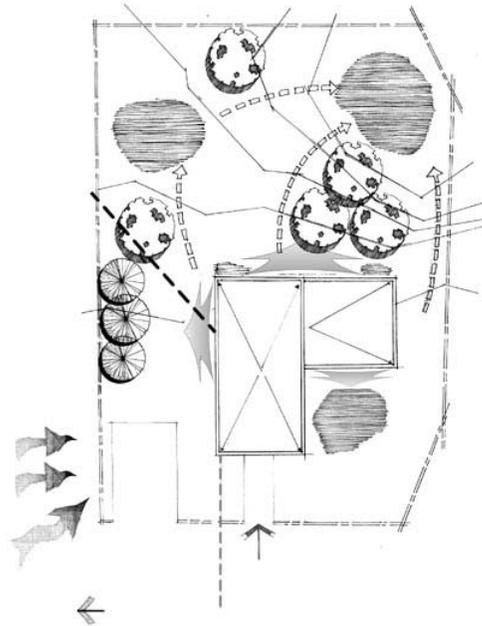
A site plan showing site characteristics (views, drainage, ... etc).
